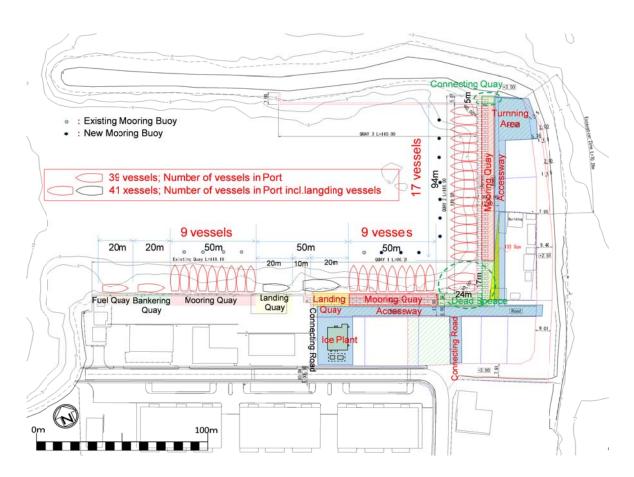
(19) Facility Allocation Plan in Providence Fishing Port
